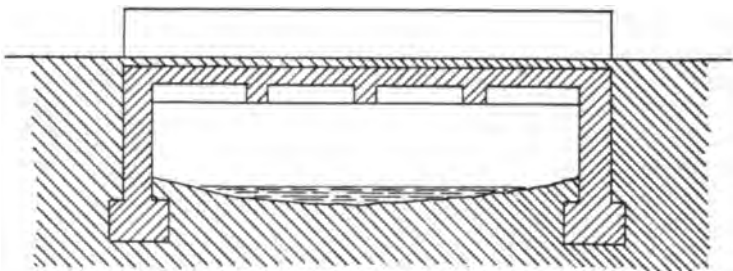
THROUGH GIRDER OR BEDSTEAD CONCRETE BRIDGE.
